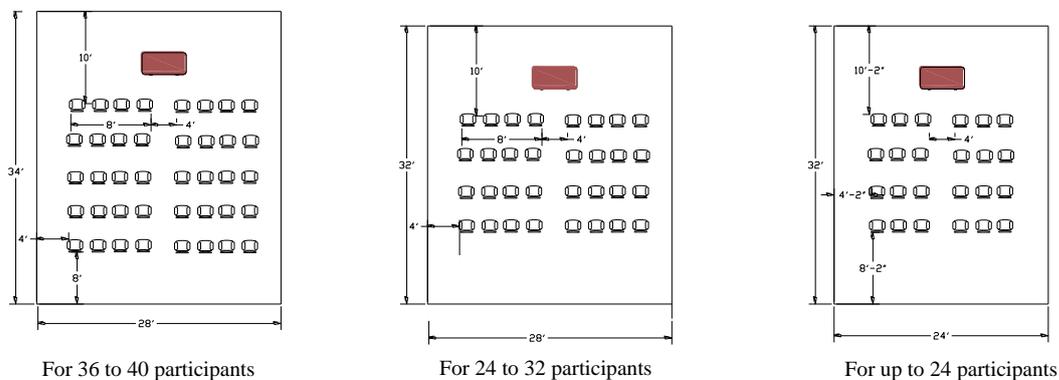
CLASS ROOM SITTING ARRANGEMENT WITHOUT TABLES
